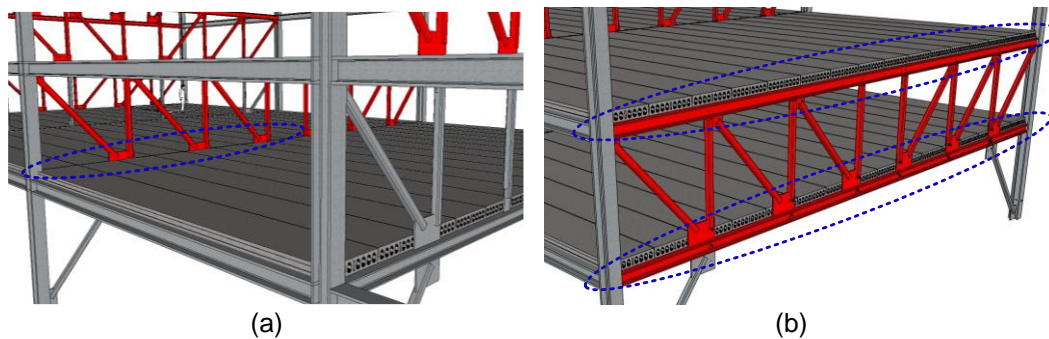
Diaphragm-to-truss connection: (a) Interior; (b) Exterior connection
